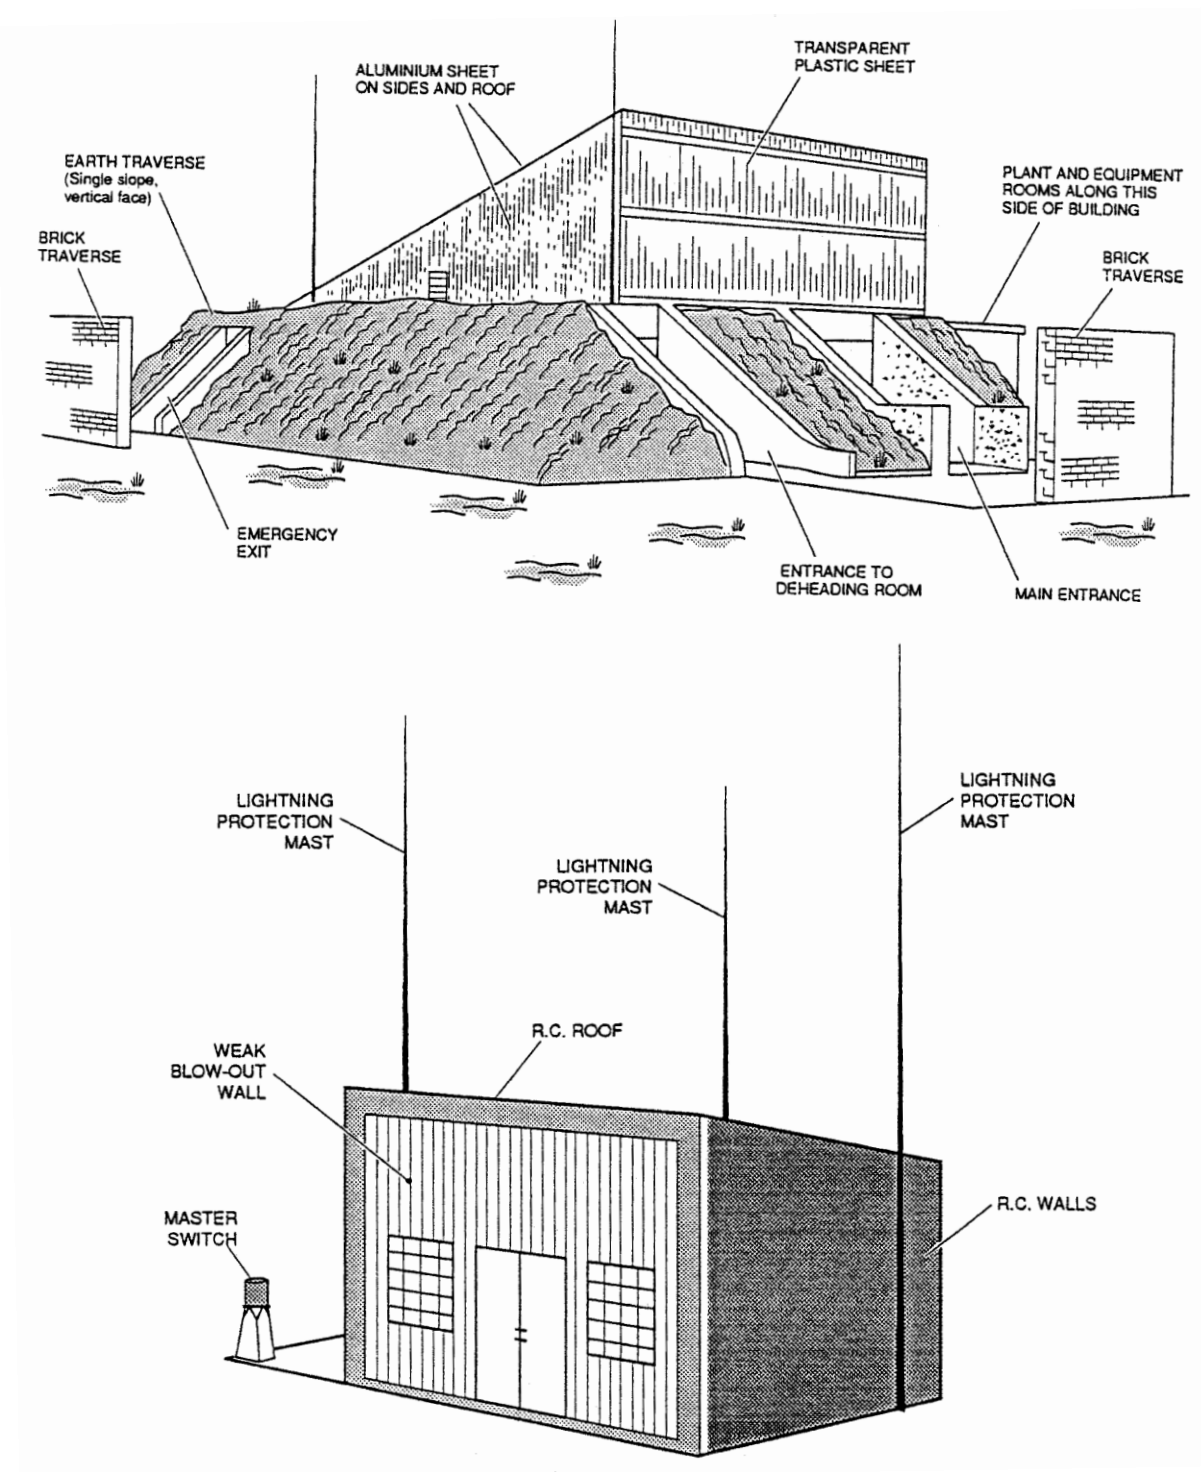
E-1 Design of Process Buildings in Reinforced Concrete with One Weak Wall
